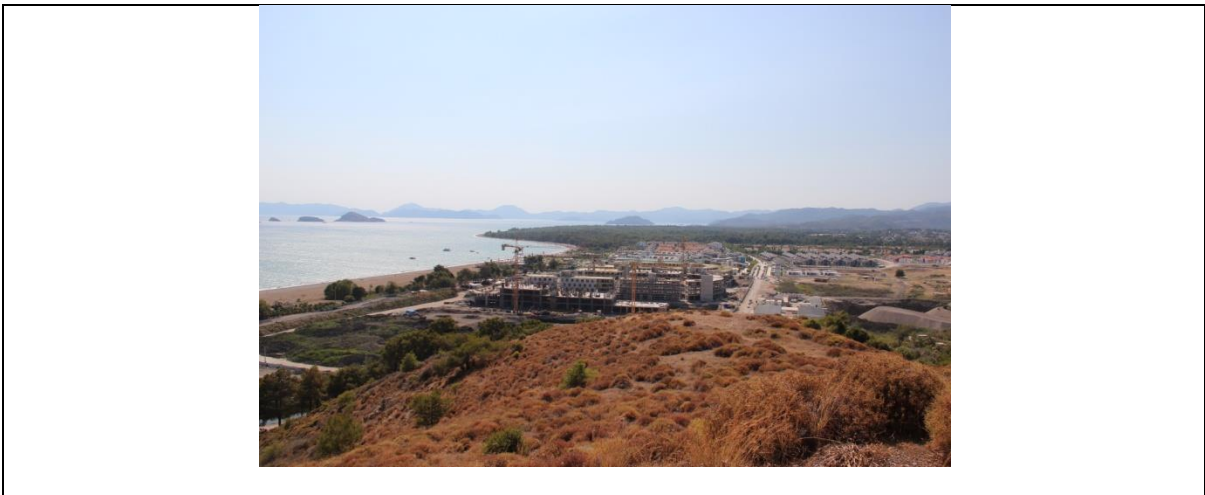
Continued. Fethiye SPA, Yanıklar. Construction of the third hotel in the section.
